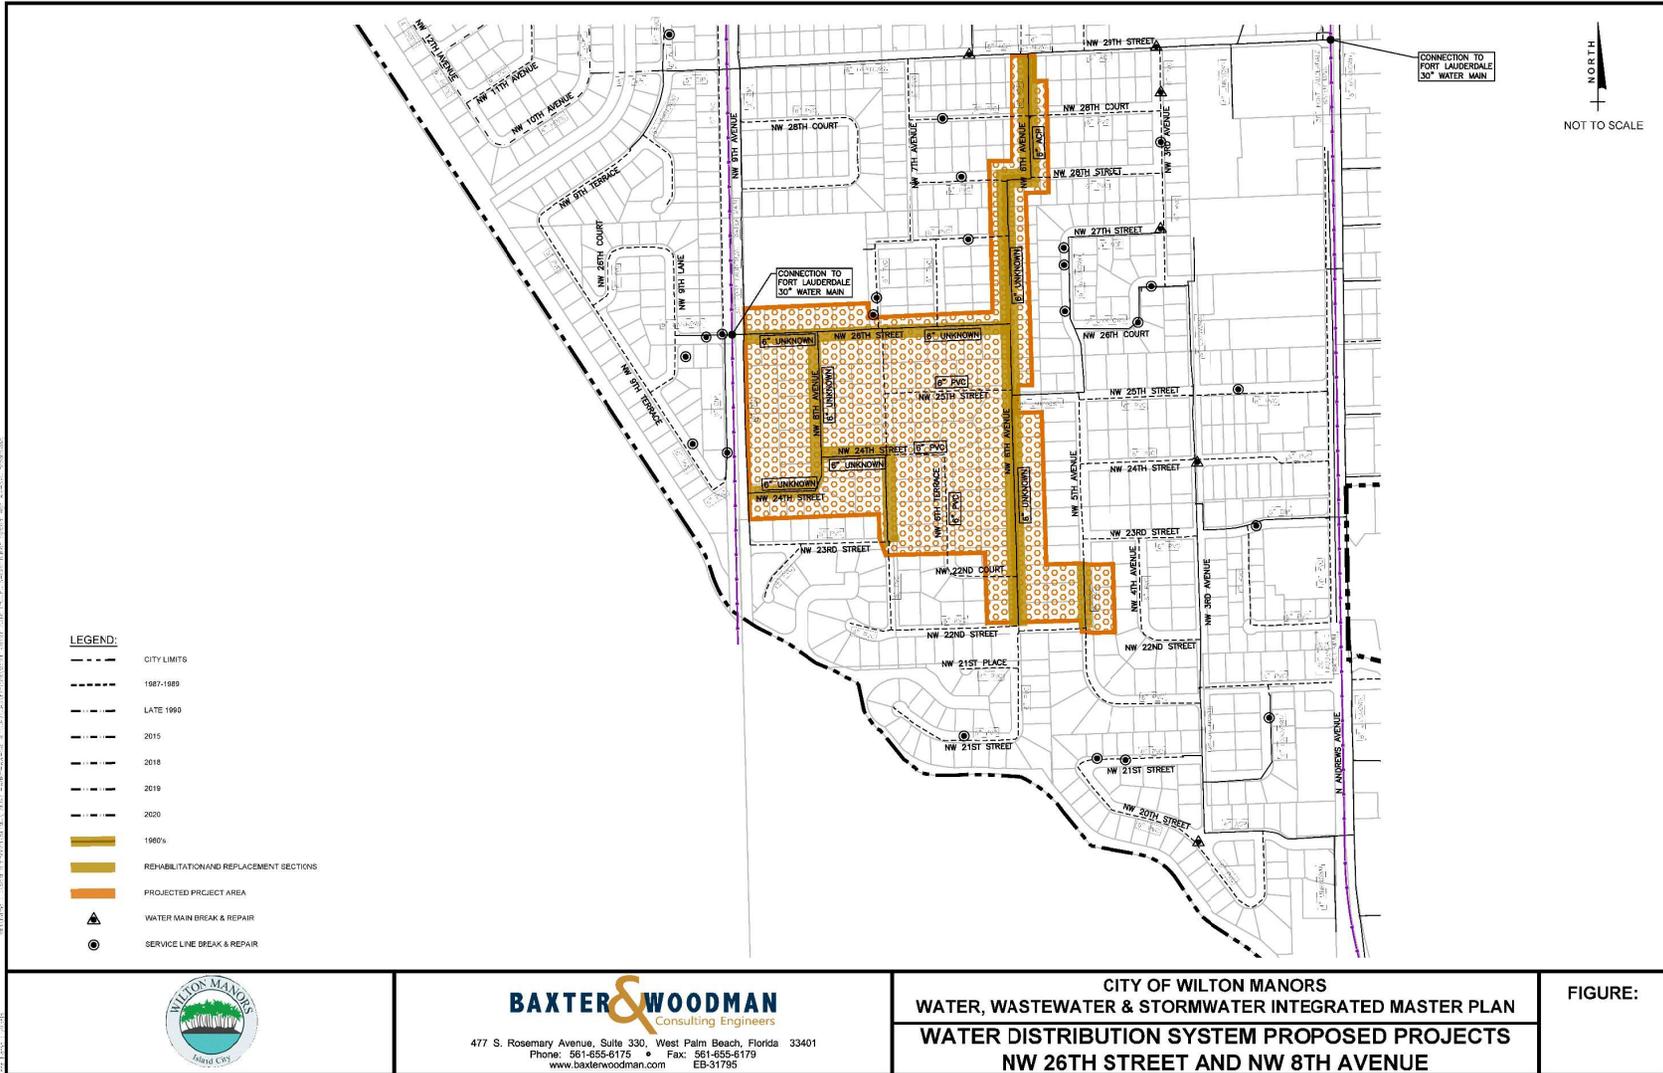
Project #14 – NW 26th Street and NW 8th Avenue Water Main Replacement
